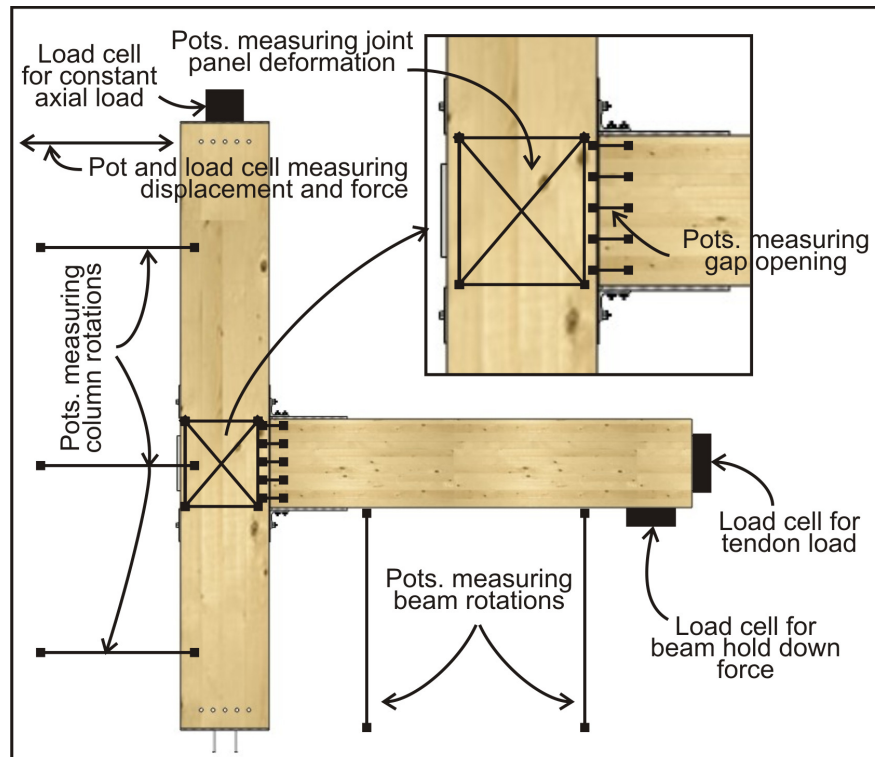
Test instrumentation for full scale post-tensioned timber beam-column joint
